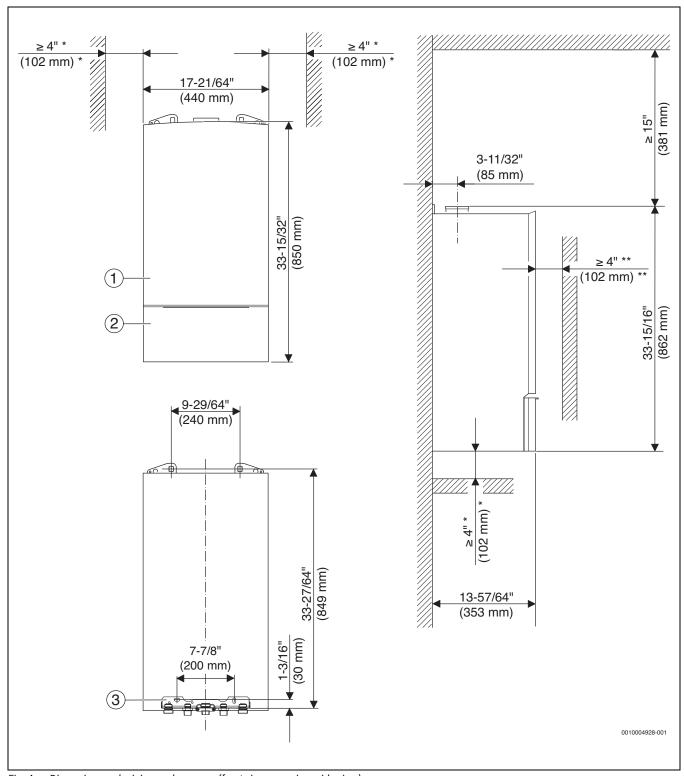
Dimensions and minimum clearances (front view, rear view, side view)
